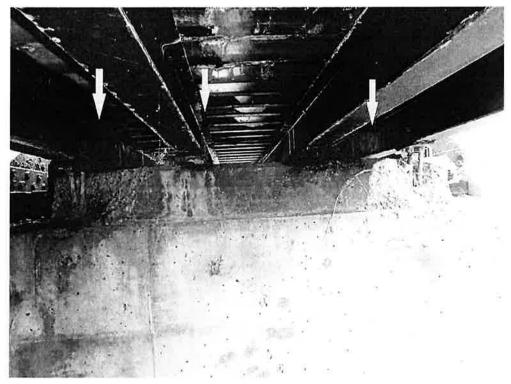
South sidewalk stringers at the southwest pier, looking east - peeling paint and moderate rust. Note the pedestals spalls below sidewalk stringers SW5 and SW8.
